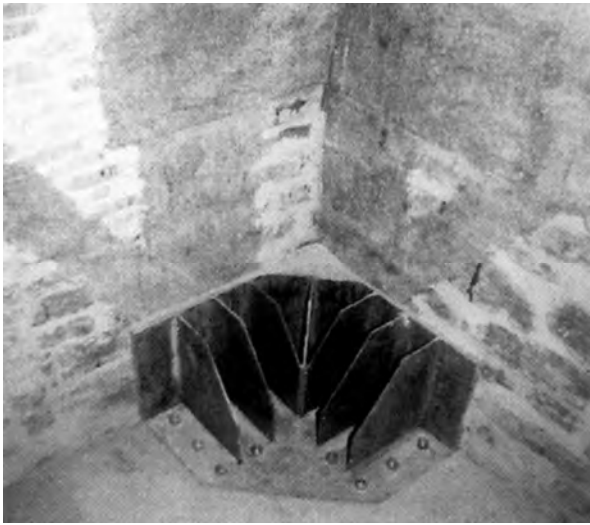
Steel device to connect a wooden floor with walls integrating wooden elements (21)
